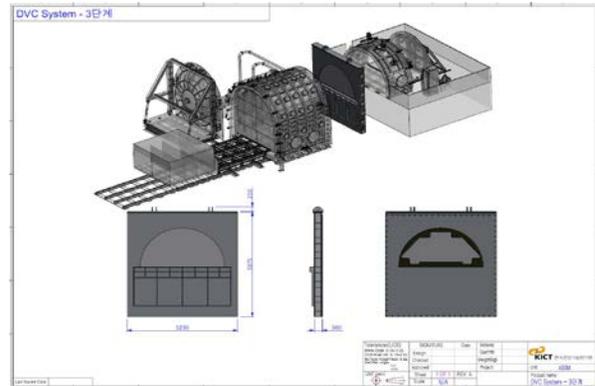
This mechanical drawing shows the details of the complete DTVC system design.
